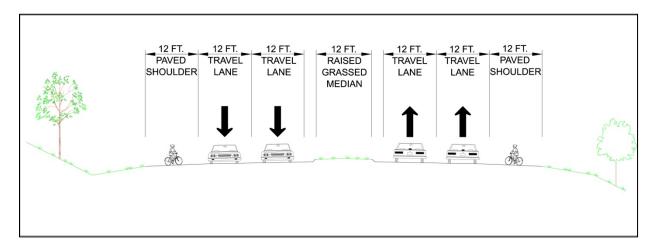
SECTION 5 HARR TOWN ROAD TO WEST OF CAROLINA POTTERY ROAD
